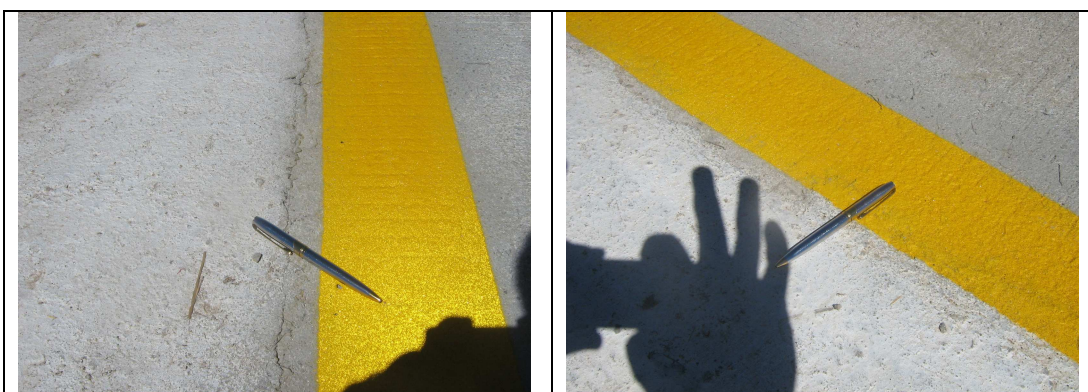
Crack in longitudinal joint with Y 12 tie bars.
